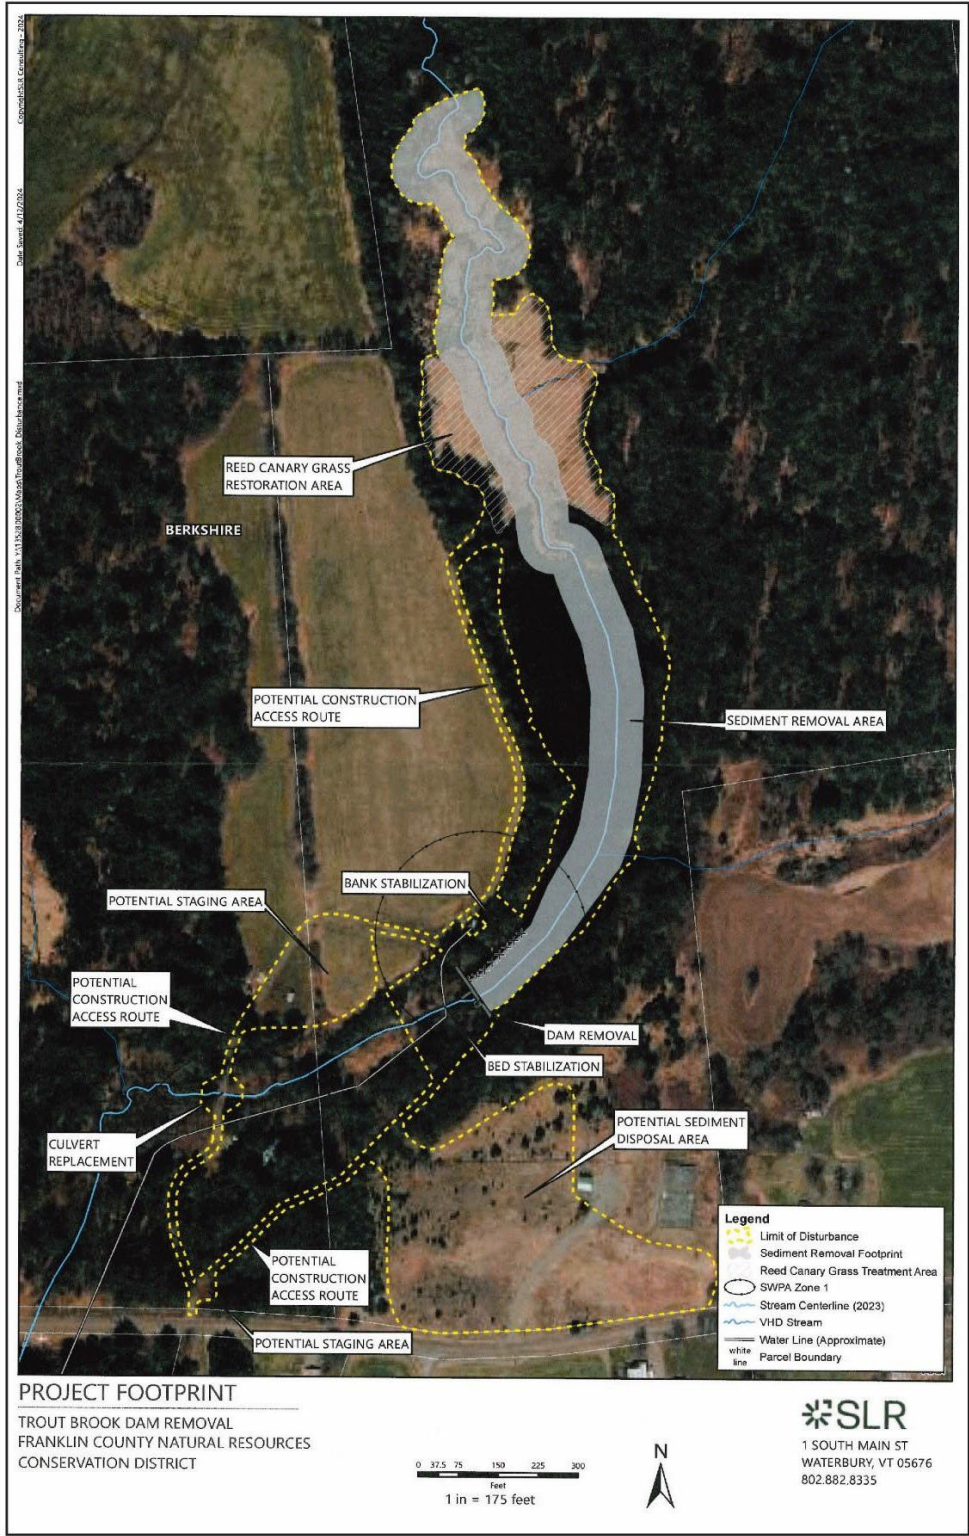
Trout Brook Dam Removal Project plans (provided by SLR).
